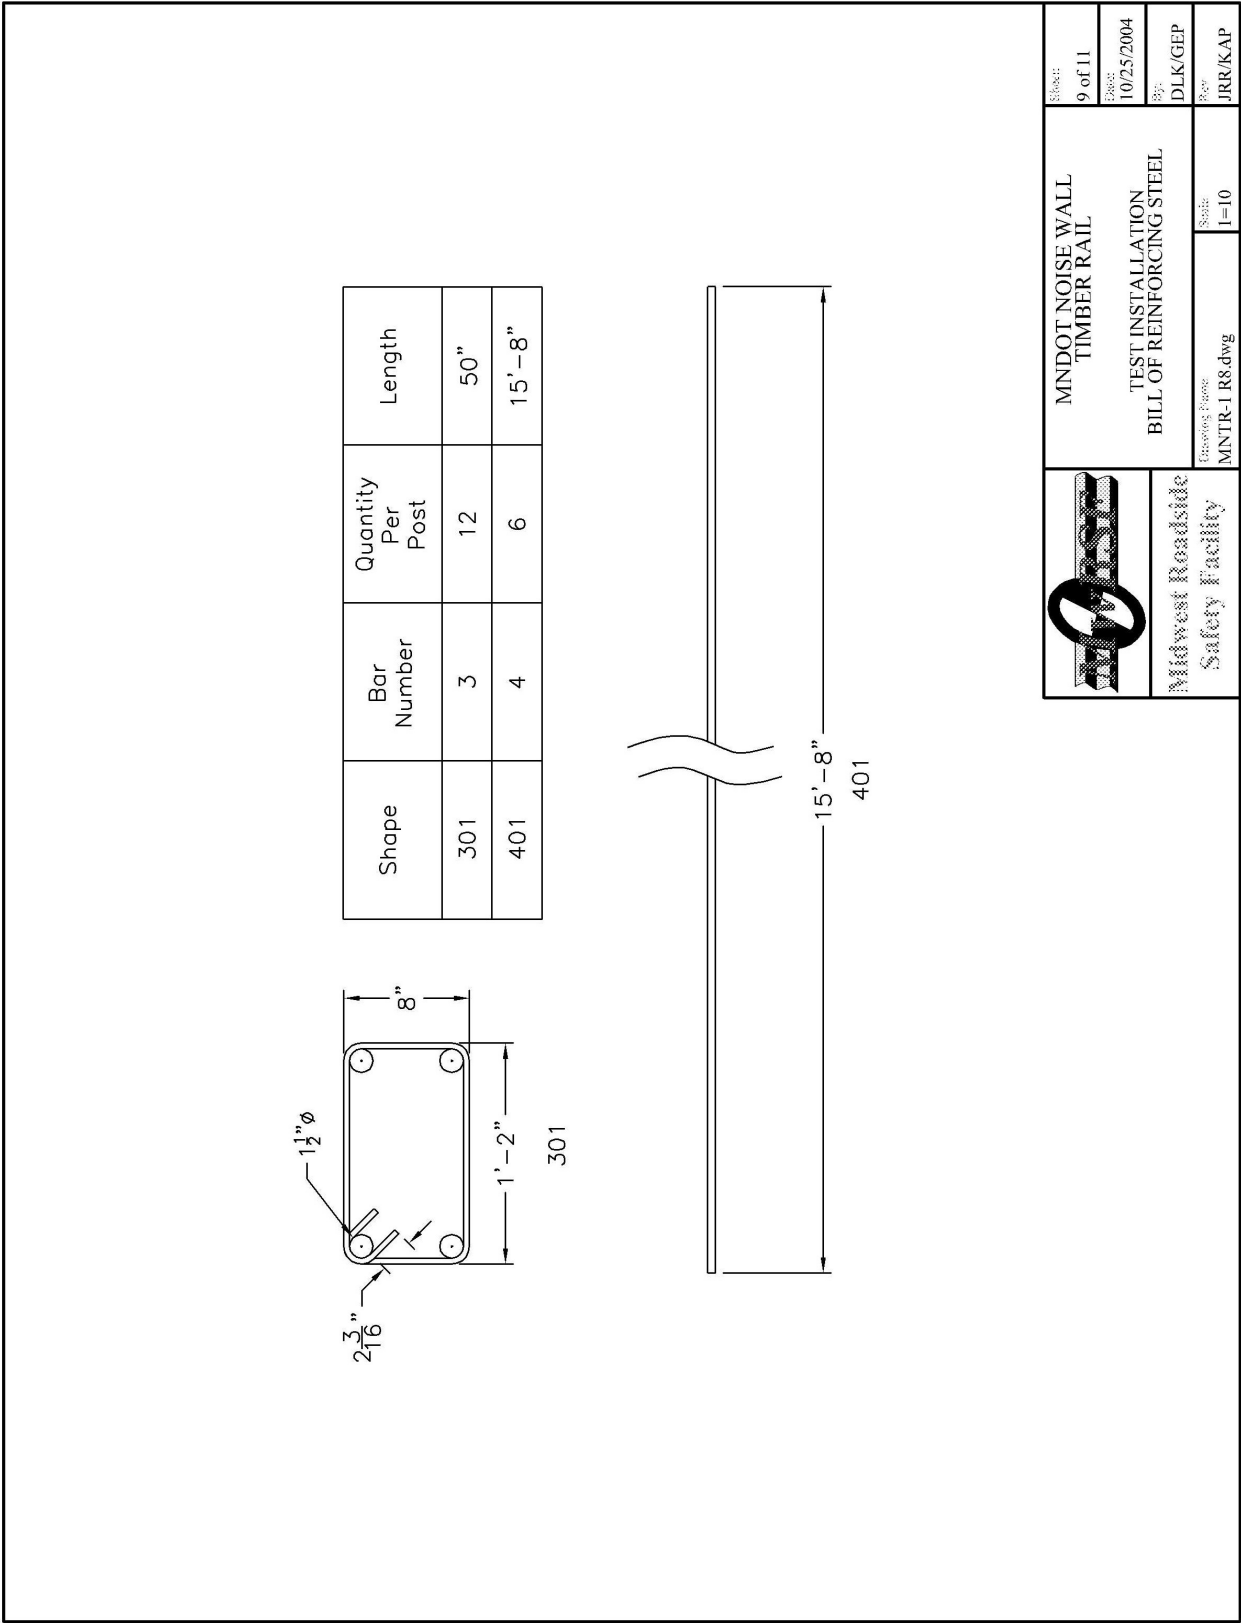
Mn/DOT's Timber Rub Rail Design Reinforcement Details (English)
